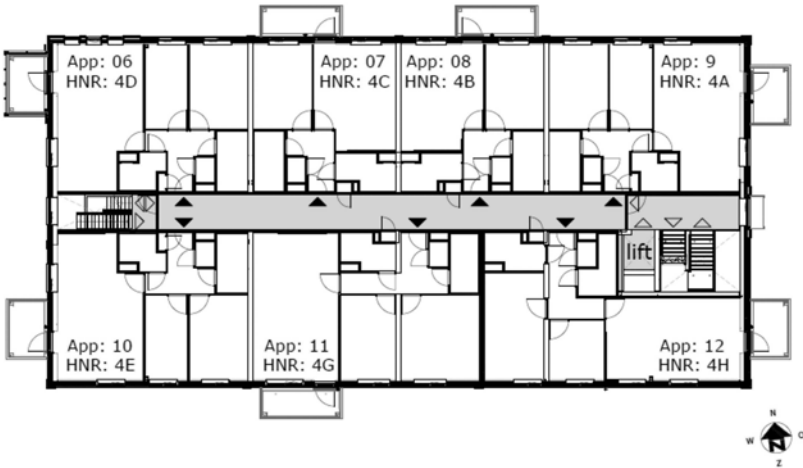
Floor layout of apartment design (de Alliantie, 2019).
